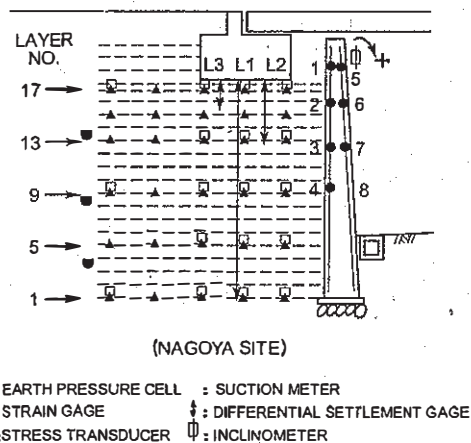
Arrangement of measuring instrumentation in the bridge abutment at Hibitsu, Nagoya
